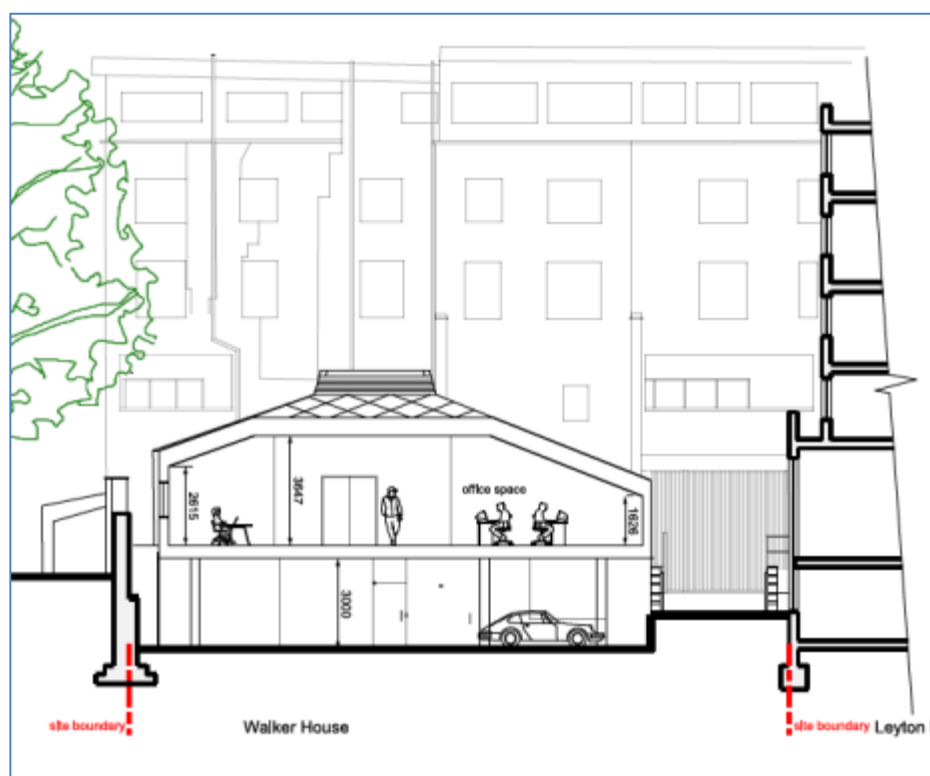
Section of proposal with lower ground and ground of Leyton House (22 Calvert) on right.
